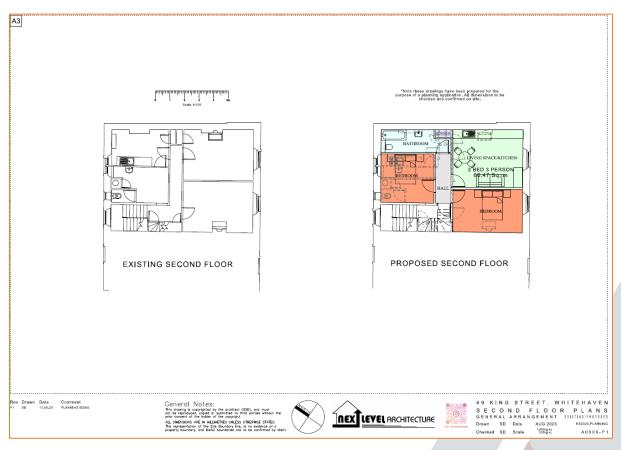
Existing and proposed second floor plans (Source: Next Level Architecture)
